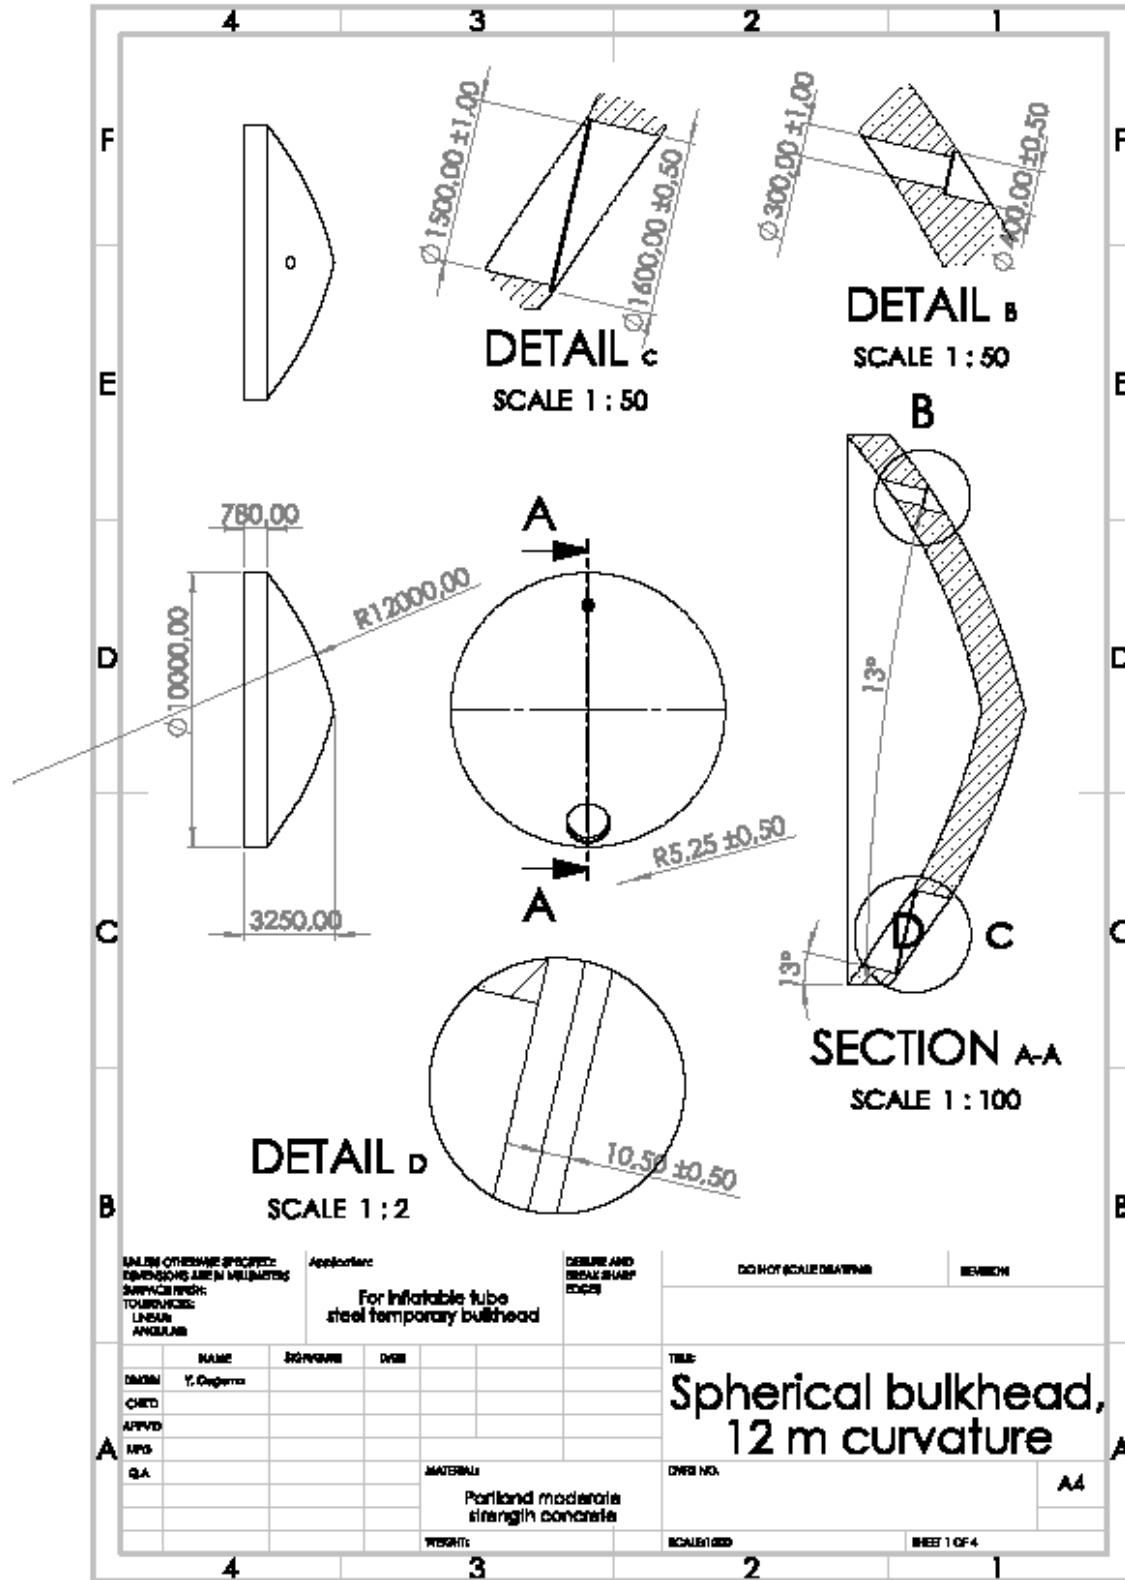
2D technical drawing of the 12 m curvature spherical permanent bulkhead for the inflatable tube steel temporary bulkhead, dimensions are in millimeters
